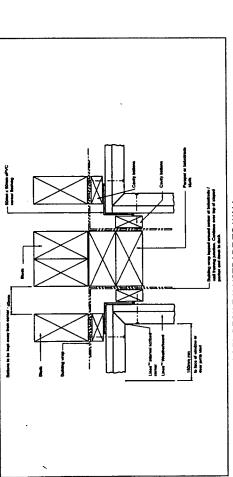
CAVITY ENCLOSED DECK BALUSTRADE TO WALL
